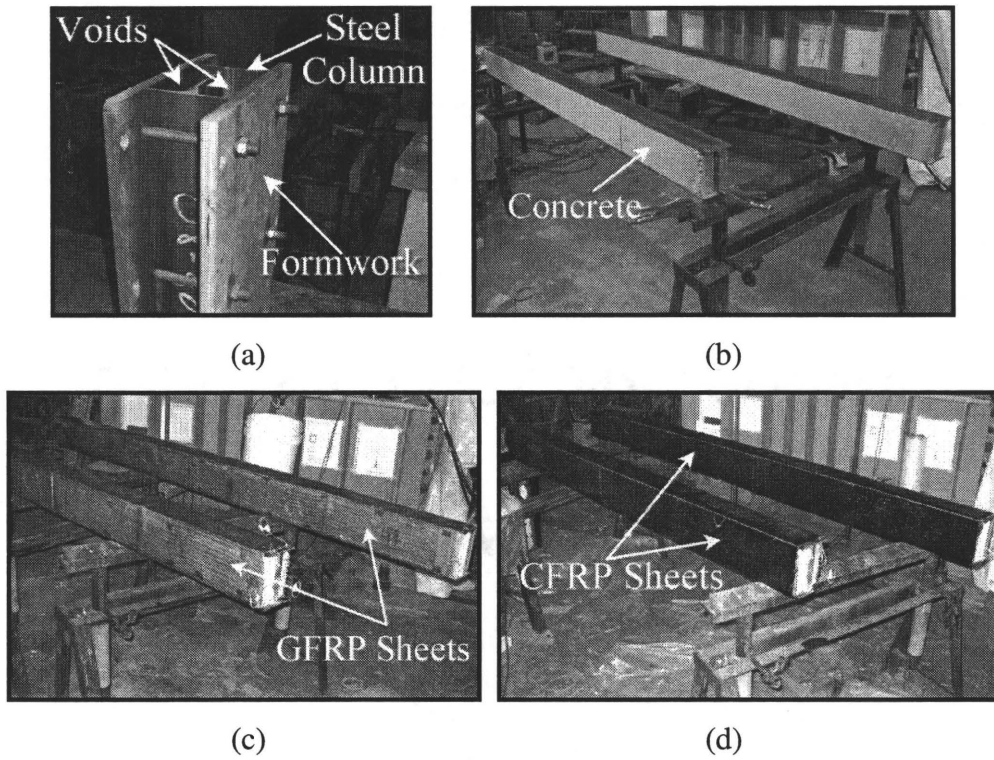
Photographs of the construction of the composite specimens (a) before pouring concrete (b) after pouring concrete (c) applying GFRP wraps (d) applying CFRP wraps
